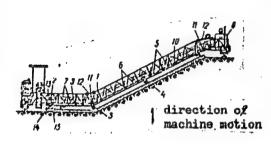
1 - frame; 2 - vibro-knife for cutting transverse joints; 3 - vibro-knife for cutting longitudinal joints; 4 - distributive nozzles; 5 - distributive nozzle valves; 6 - system of levers; 7 - discharge tank; 8 - horizontal truss of frame; 9 - inclined truss of frame; 10 - horizontal hinges; 11 - screw devices; 12 - working parts of vibro-knife for cutting transverse joints; 13 - vibro-knife support; 14 - cutting plates; 15 - vibration isolating plate.
